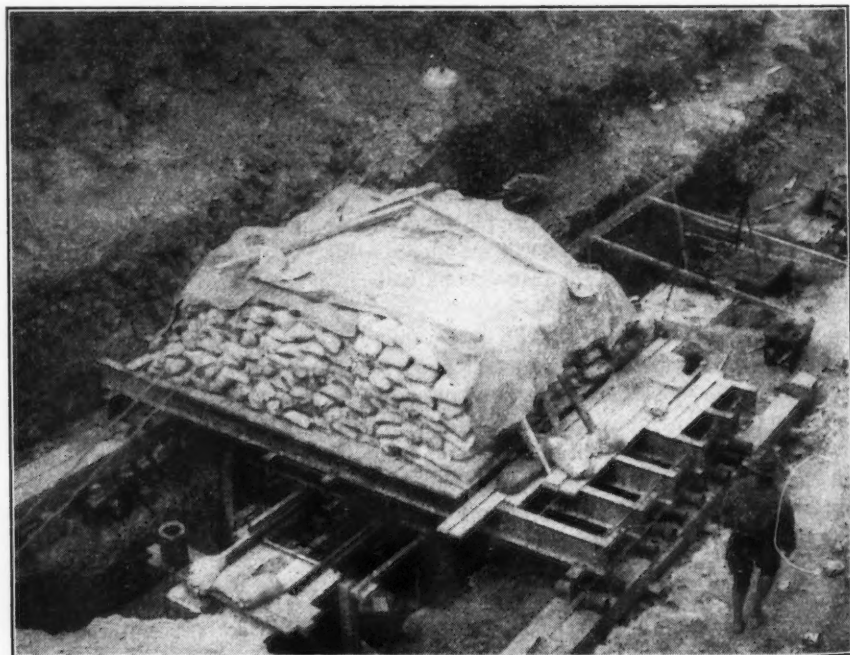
GENERAL VIEW OF THE TEST TRENCH AND APPARATUS
